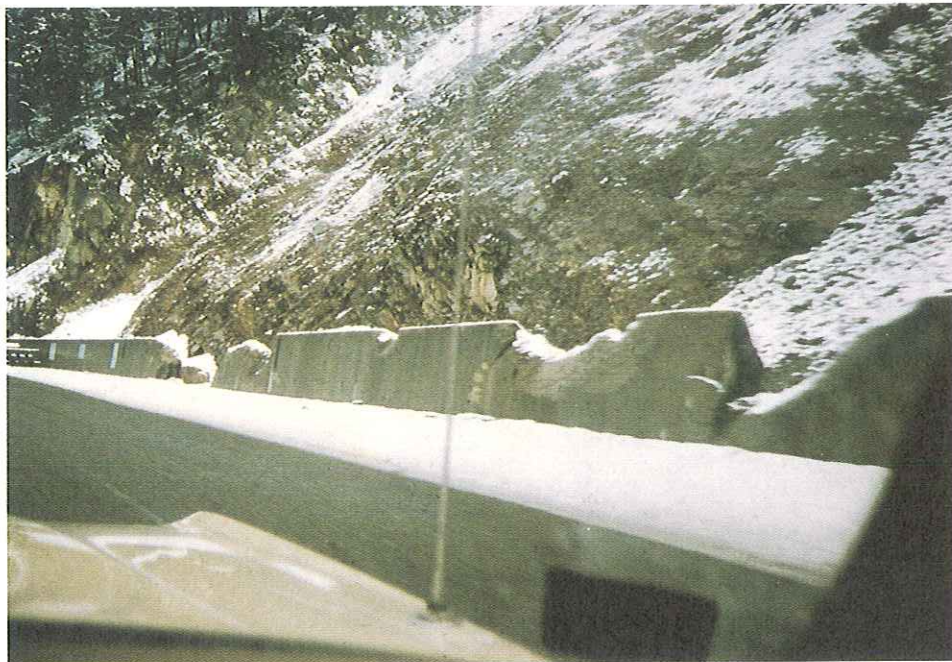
Rigid concrete wall badly damaged by large raveling rock. Flexible-type walls resist impact better than rigid walls.
